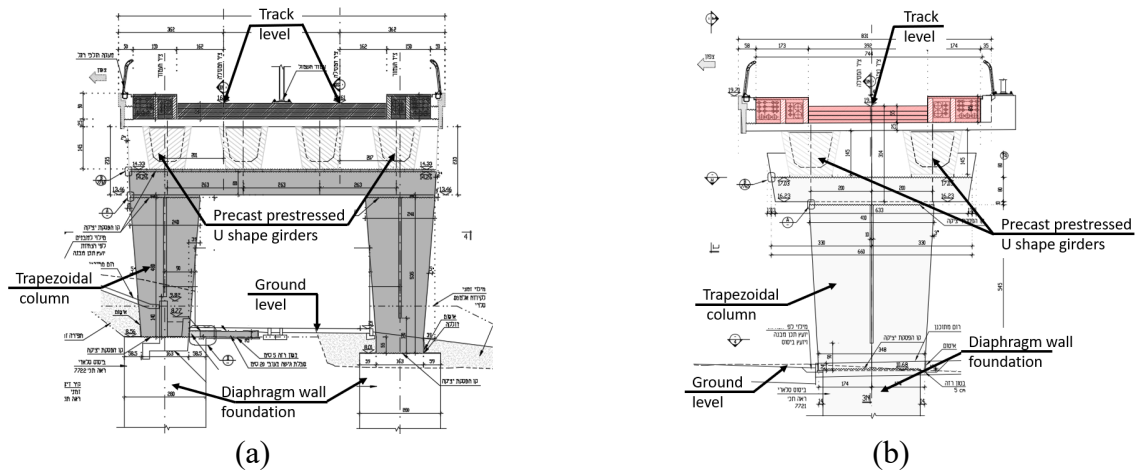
Pinahs Rosen bridge cross sections - (a) Piers 2 and 4 frame; (b) Pier 5-13 fixed column
